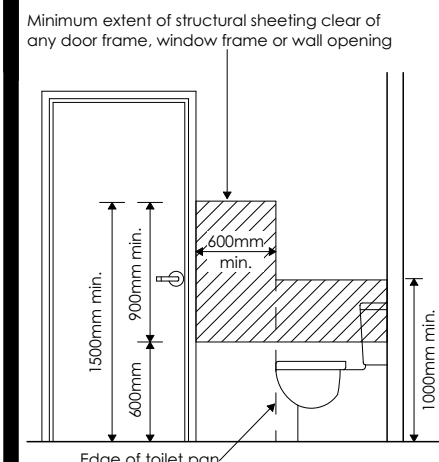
BELOW LOCATION OF NOGGINGS FOR A WALL BEHIND A TOILET PAN
